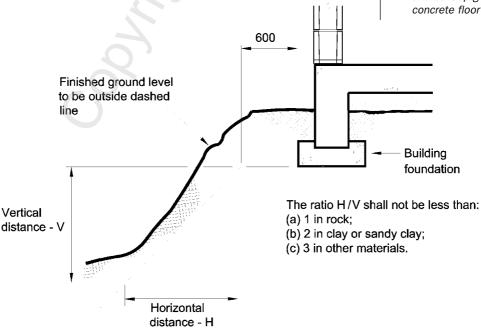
Relationship of foundation to sloping ground surface (see 3.1.2(b)
